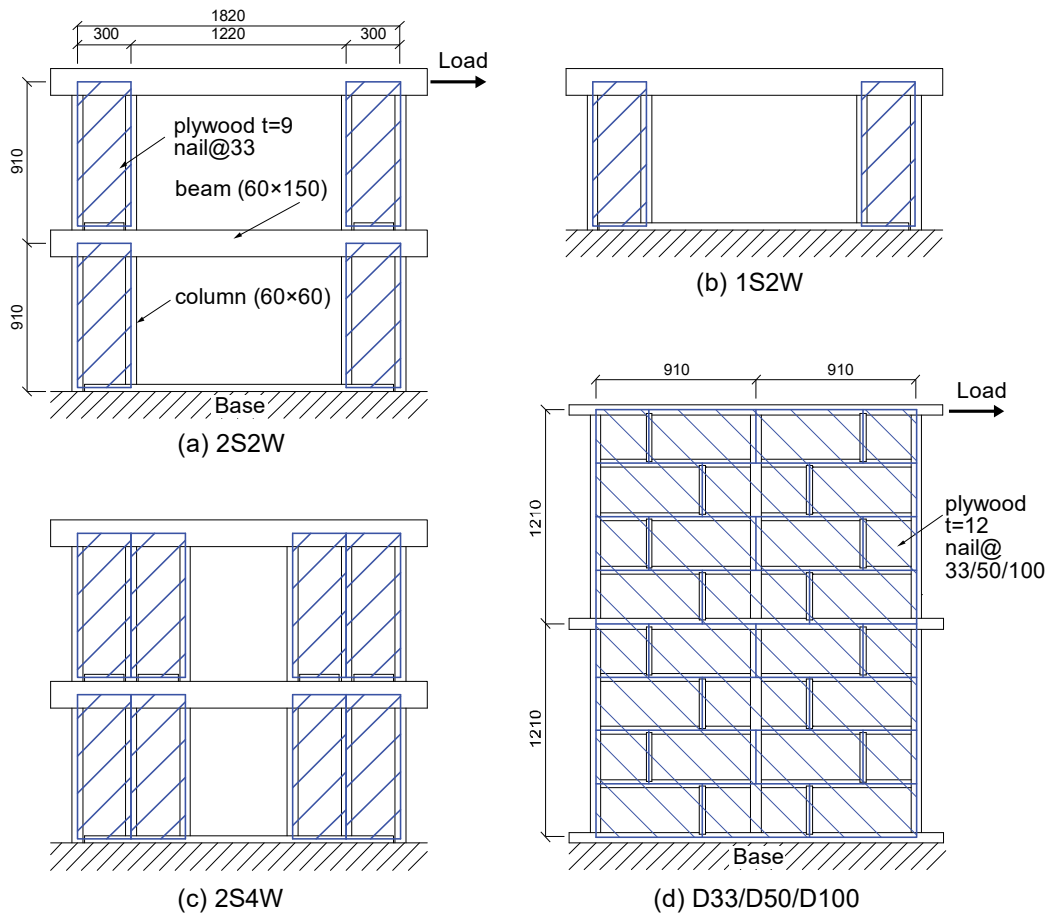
Design of specimens in the pilot experiment (dimensions in millimeters), (a-c) shear wall, (d) diaphragm
